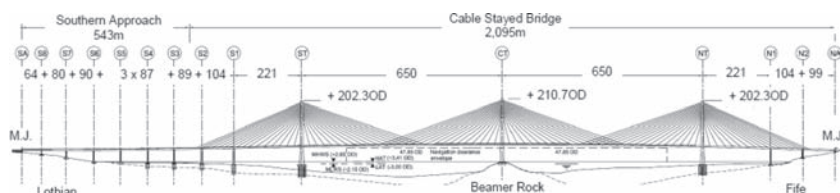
General arrangement (orthotropic deck variant) [dimensions in meters].
